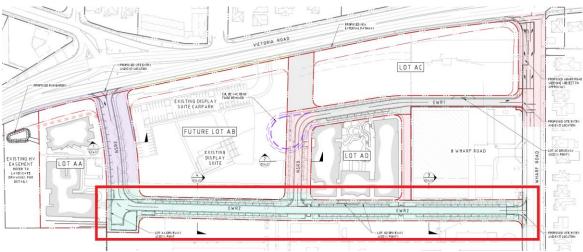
Draft Masterplan envisaged by Melrose Park North Planning Proposal.
